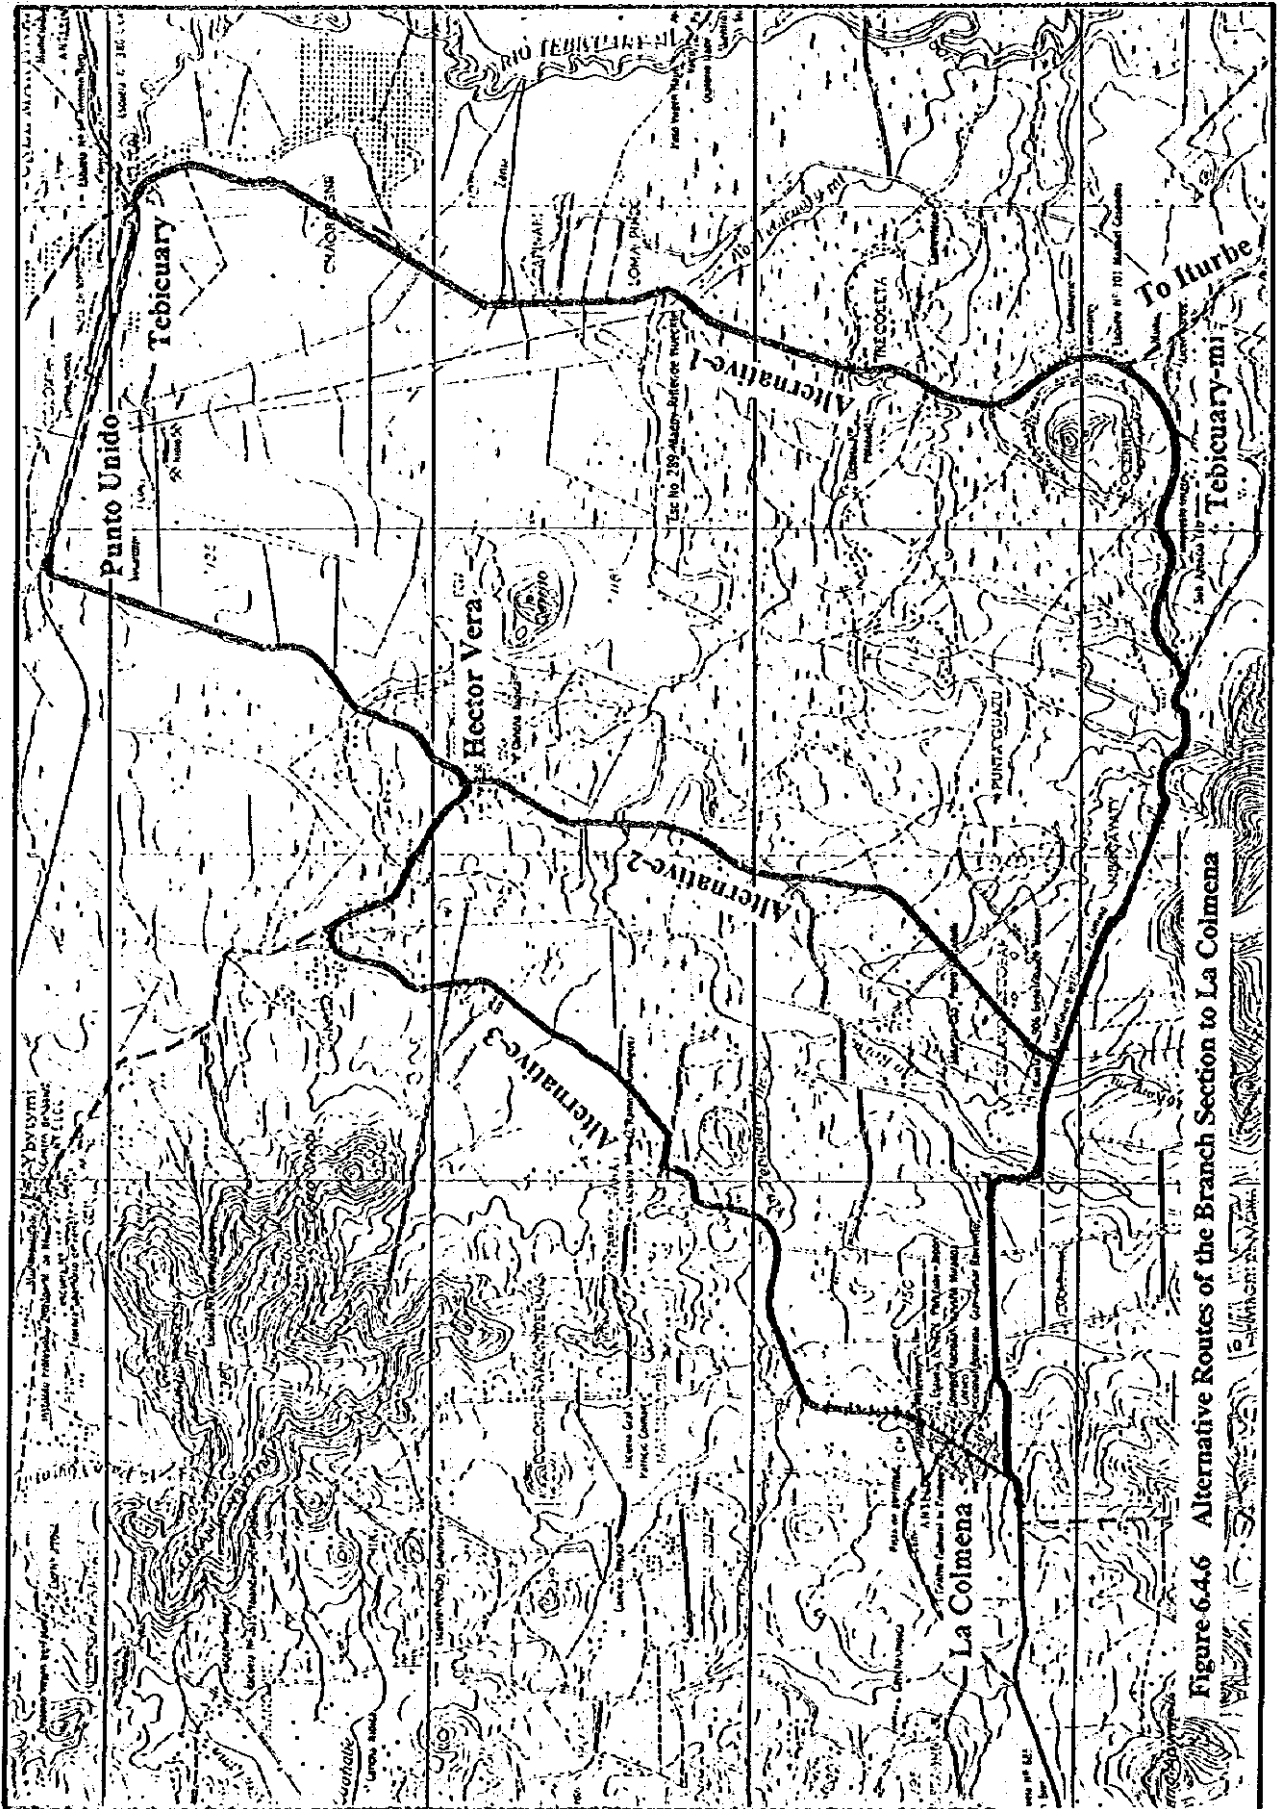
Alternative Routes of the Branch Section to La Colmena
